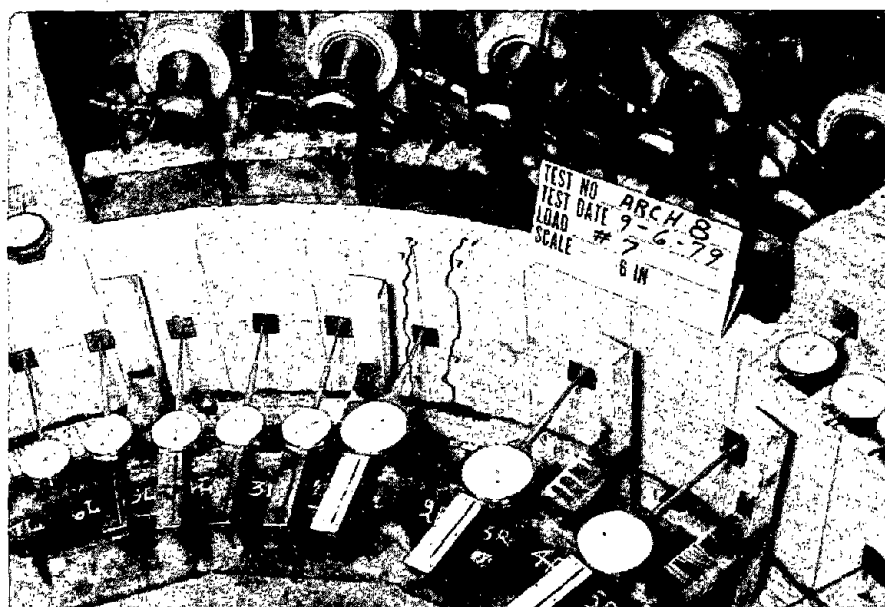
FIRST CRACKING OF ARCH-8
